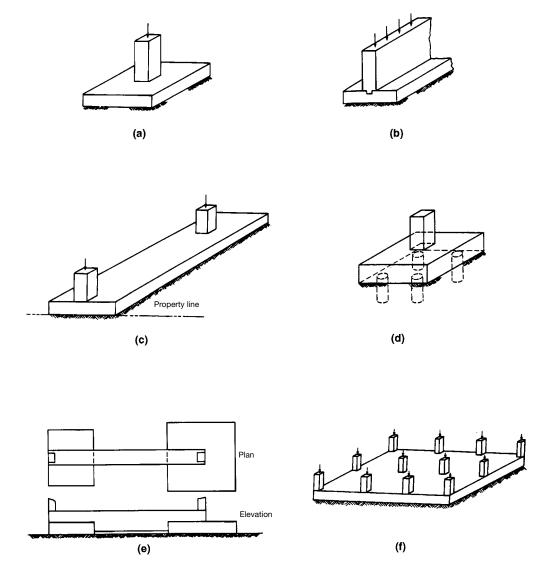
B.I Types of footings. (a) Spread footing. (b) Strip or wall footing. (c) Combined footing. (d) Pile cap. (e) Strap footing. (f) Mat or raft footing.
